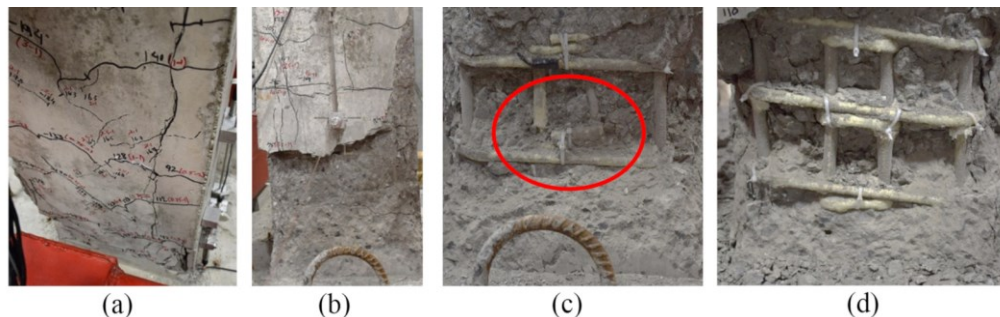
Failure progression of GFRP-reinforced concrete columns: (a) vertical splitting; (b) cover spalling; (c) longitudinal bar fracture; and (d) core concrete crushing
